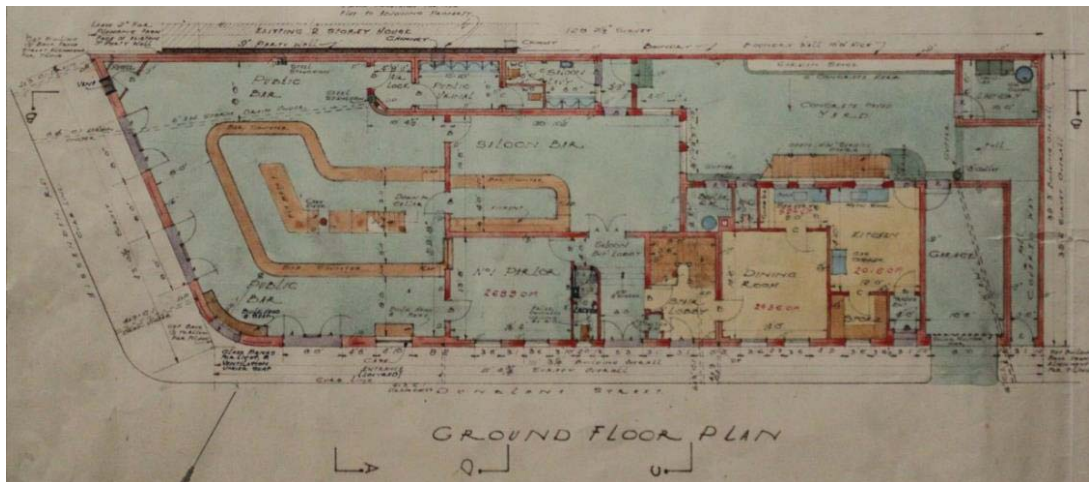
Extract from Building Application Plans comprising ground floor plan, 1939. (Source: City of Sydney Archives, BA 266/39)
